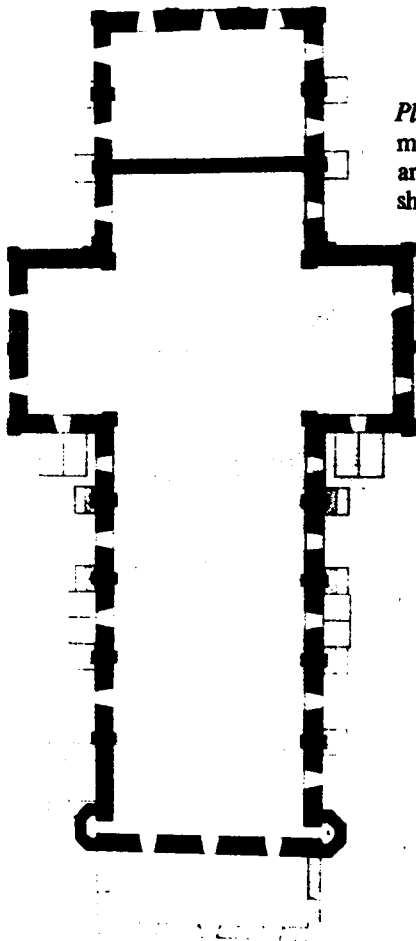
Floor plan of Loboc church based on measurements done on the spot. Later additions are cross-hatched. The Jesuit built portion are shaded black.
